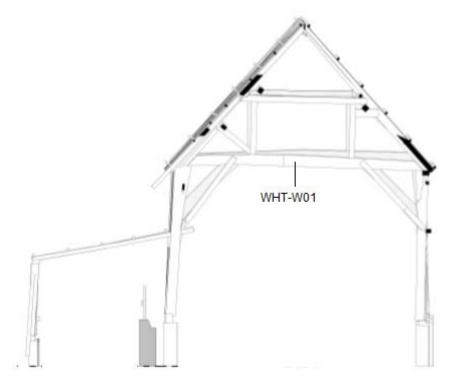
Section through Truss 1, east face, showing the sampled timber, WHT-W01 (after ATD London Ltd)
